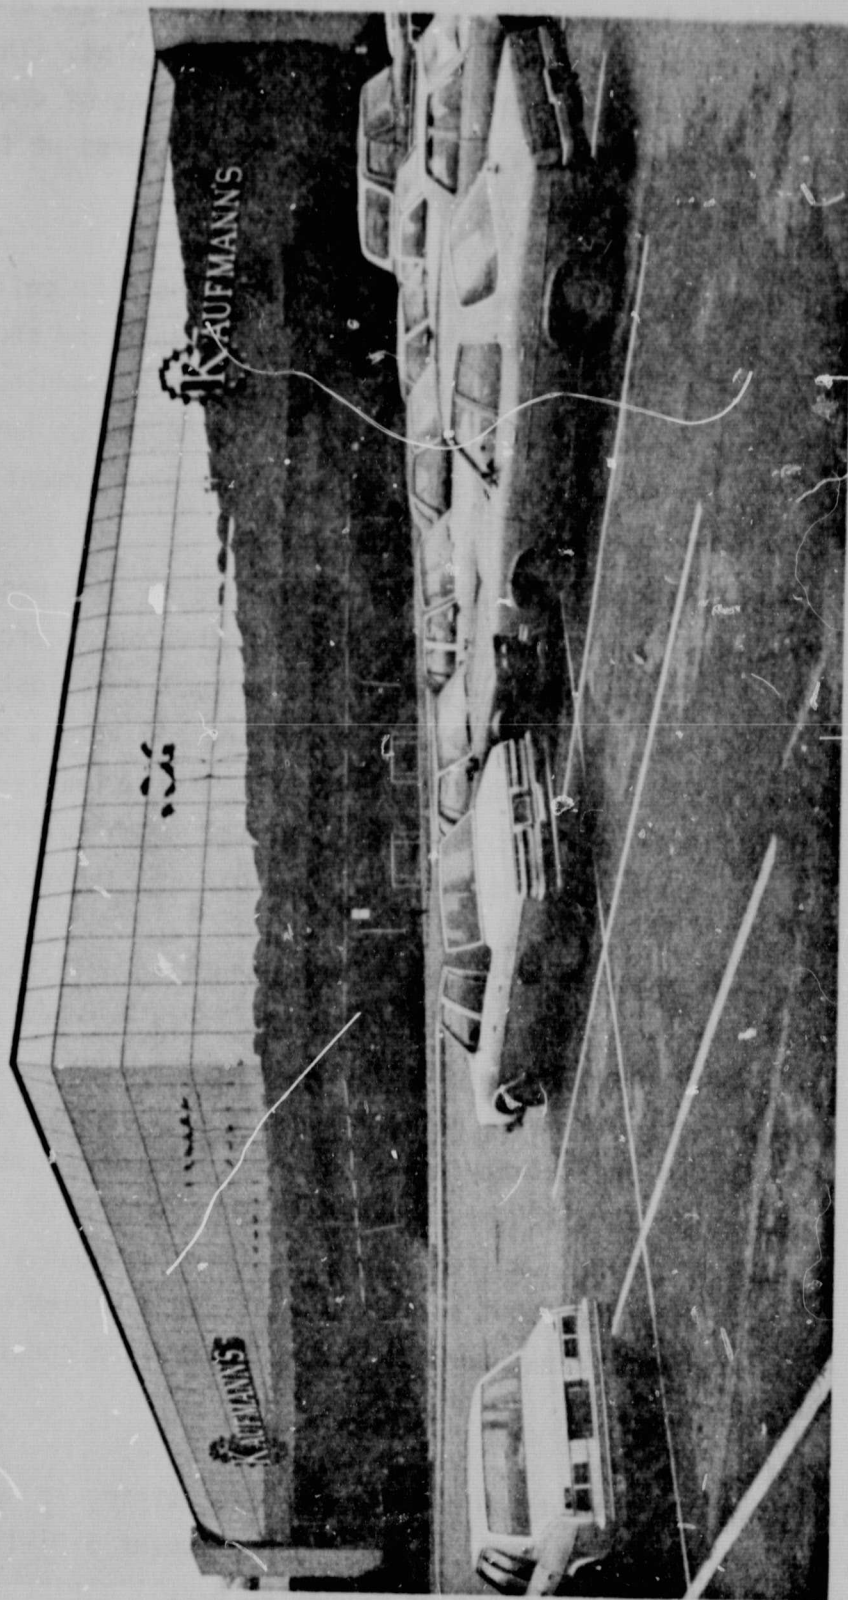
Glass Panelled Wall Utilizing Structural Adhesive Supports
